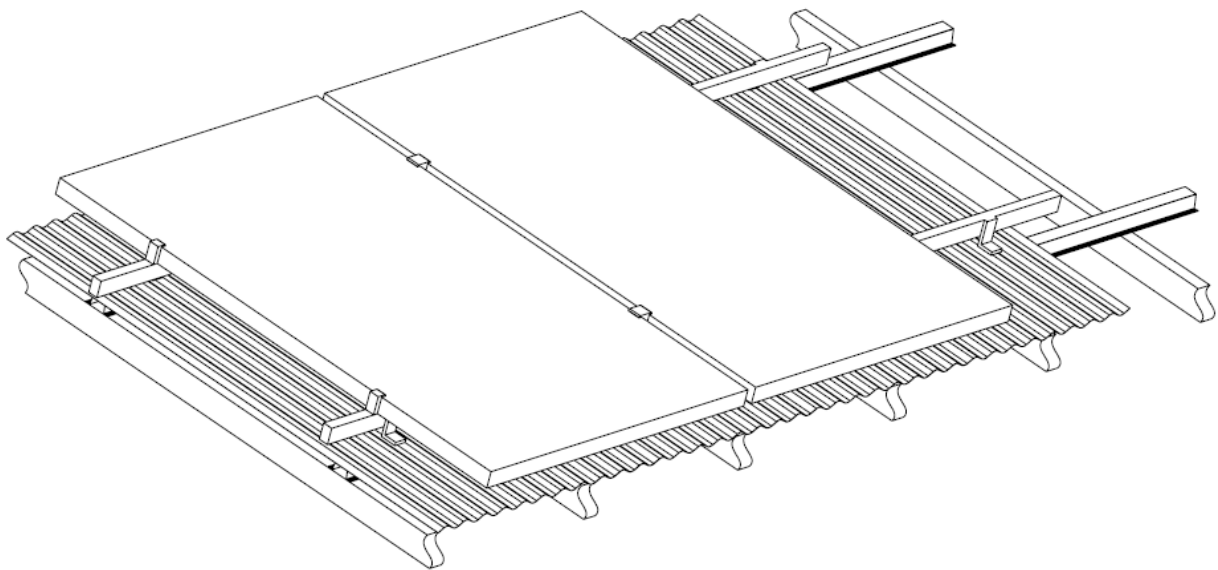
Typical layout of solar panel arrays on the roof of houses and structural support system for solar panels mounted parallel to pitched roofs
